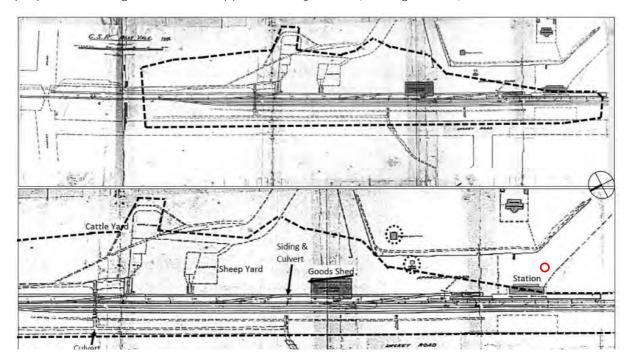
Overlay of 'The Great Southern Railway: Moss Vale, General Plan 1888' with the approximation the modern SHR curtilage. The location of the proposed geotechnical works is marked in red. (Source: AMBS Ecology & Heritage 2017, fig. 2.6)
